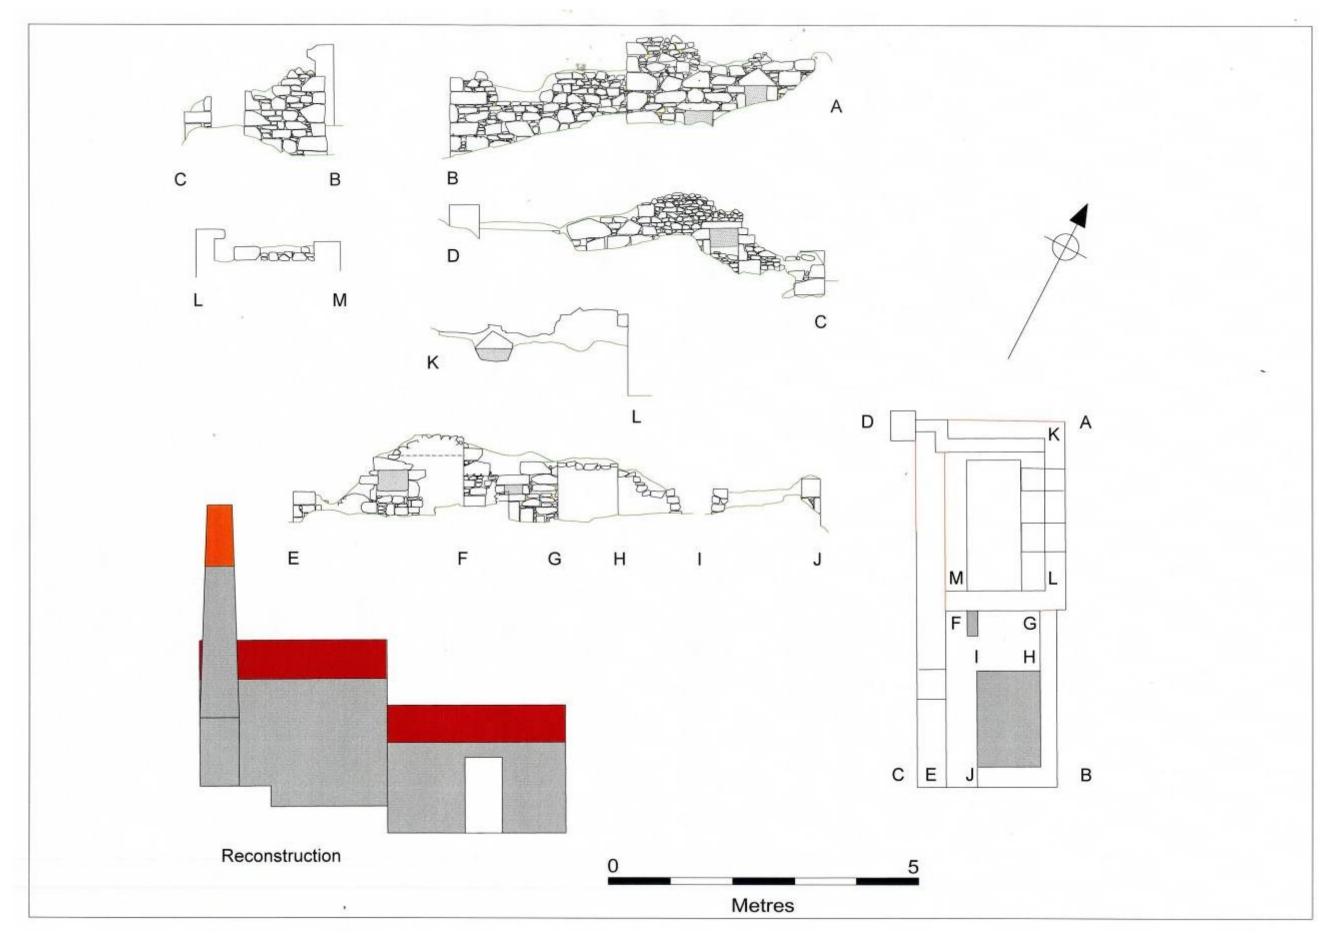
Plan and elevations of the Wheal Call reverberatory arsenic calciner, together with a reconstruction of its likely original appearance.
